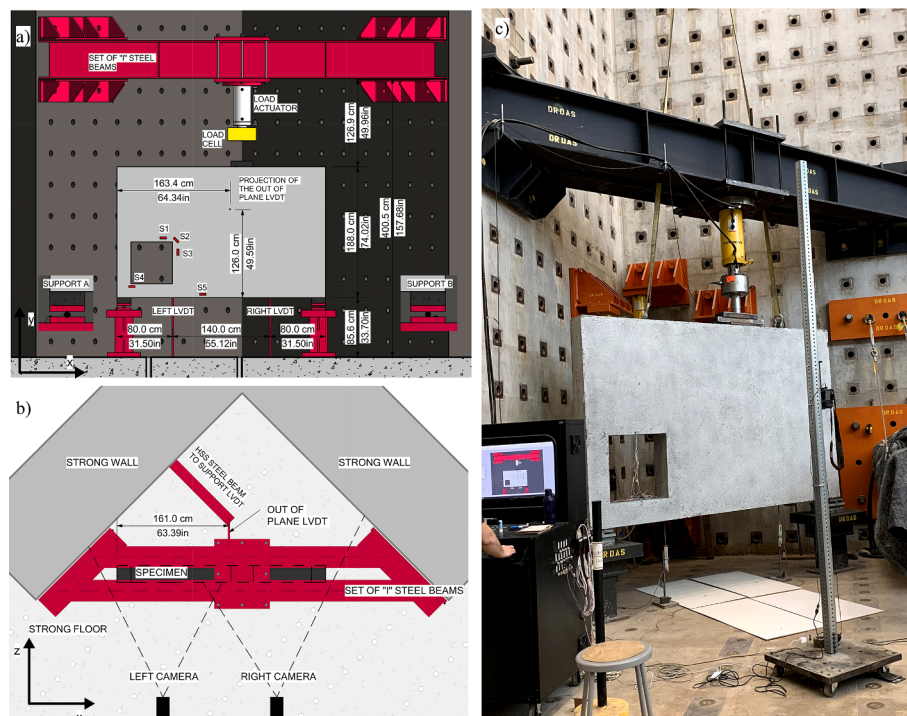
SI.a Test setup: a) frontal elevation; b) top view; and c) photography.
